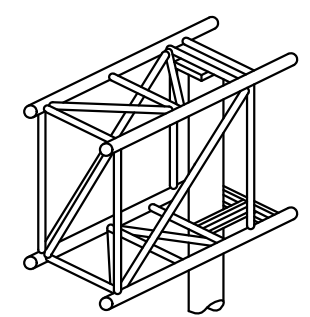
DETAIL OF TOP CHORD CONNECTION TO COLUMN
